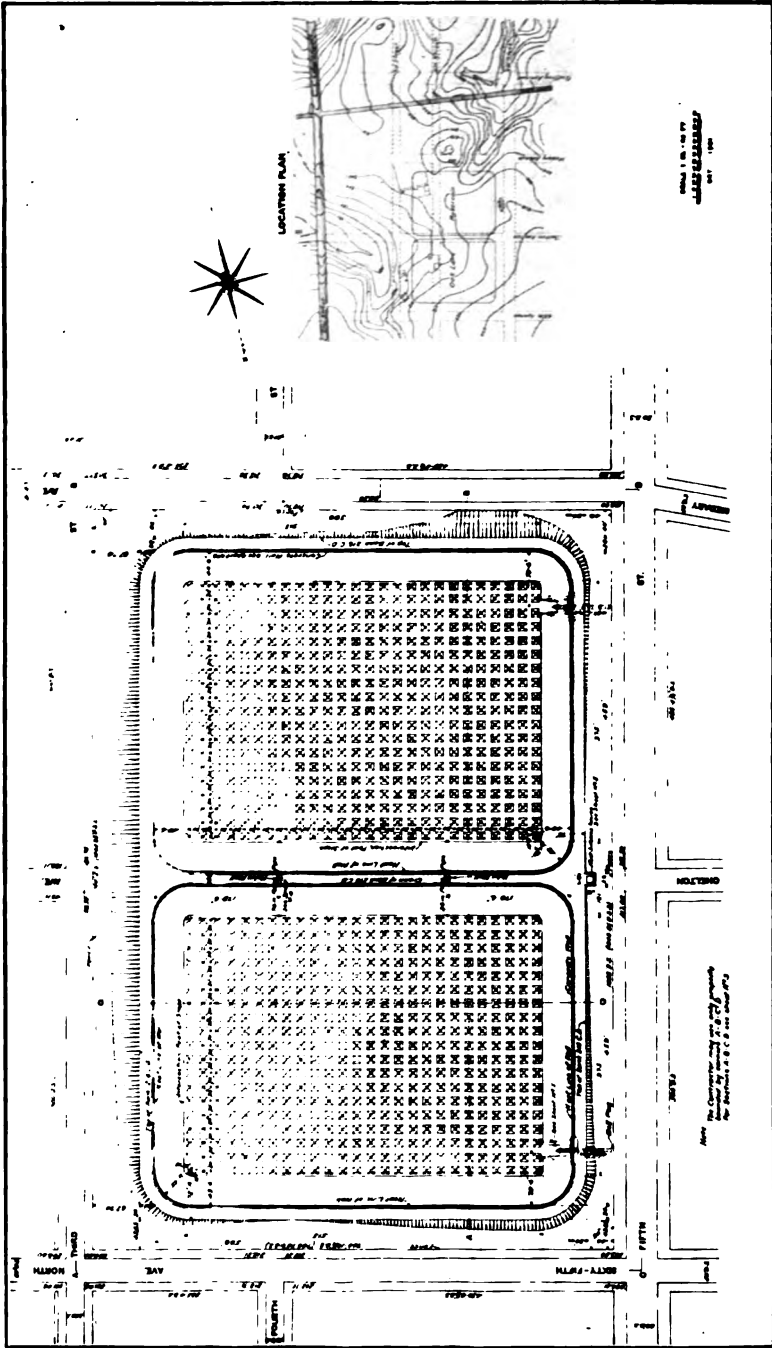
OAK LANE RESERVOIR—GENERAL PLAN.
